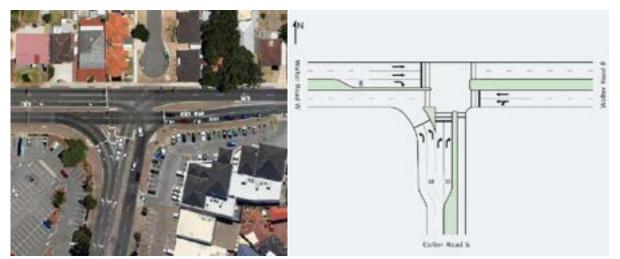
Walter Road/Collier Road Intersection – Existing Geometry
